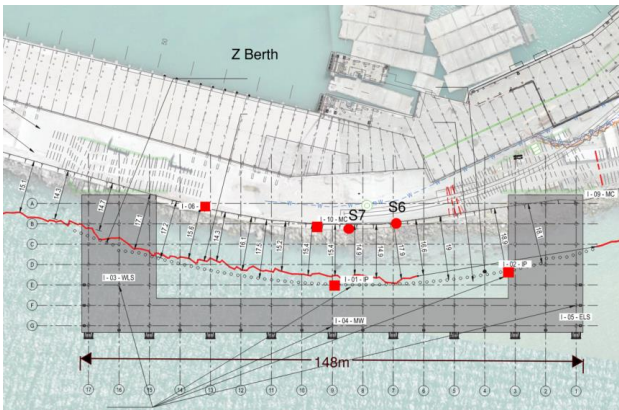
Cruise Berth (shaded in grey) Site Plan.
